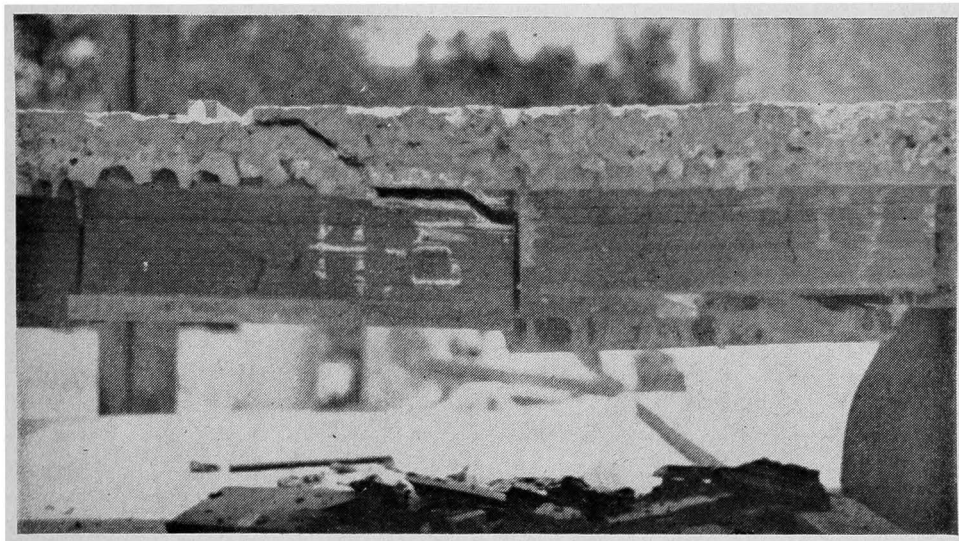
(a). The condition of the flange tile after failure has taken place. This type of failure was typical of Tile B which was a low strength tile.
